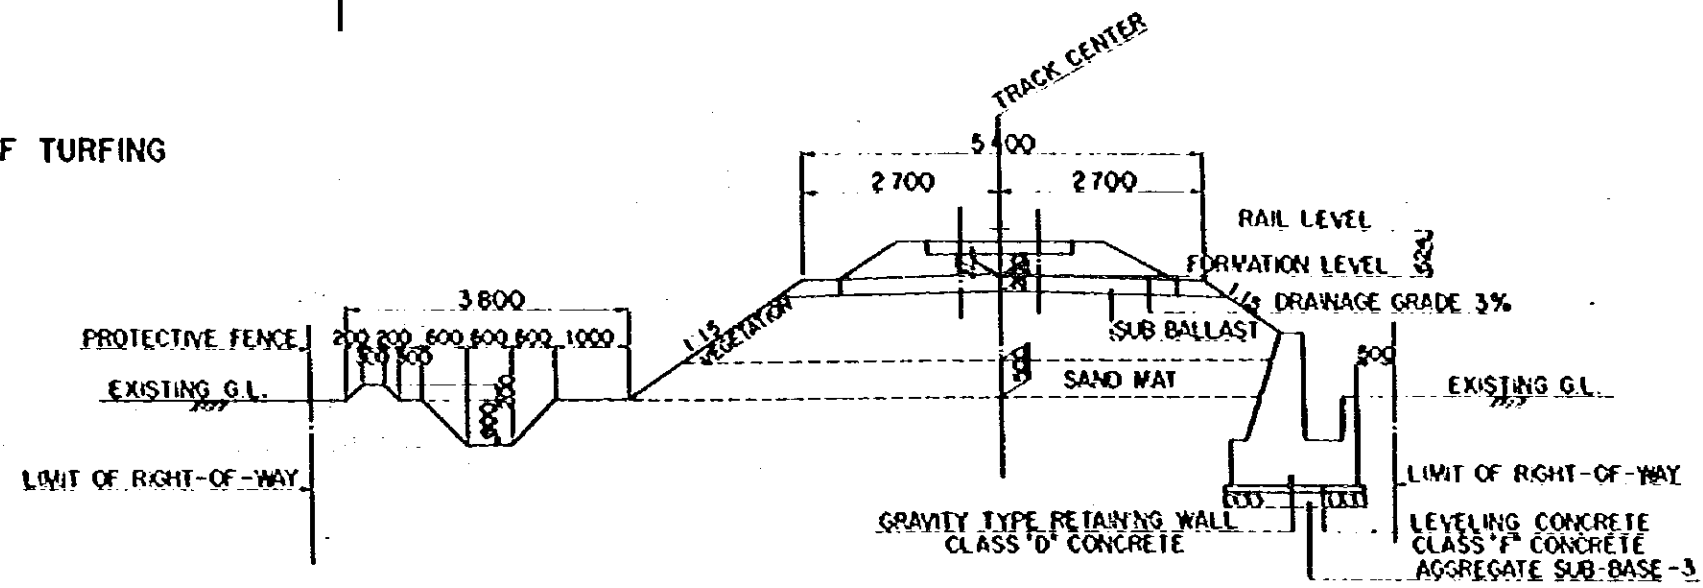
Roadway Diagram (Straight Section, Urban Area)
